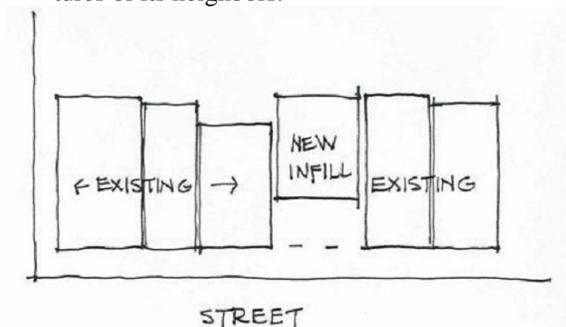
Inappropriate Alignment - new infill building has been set back from established "streetwall"
